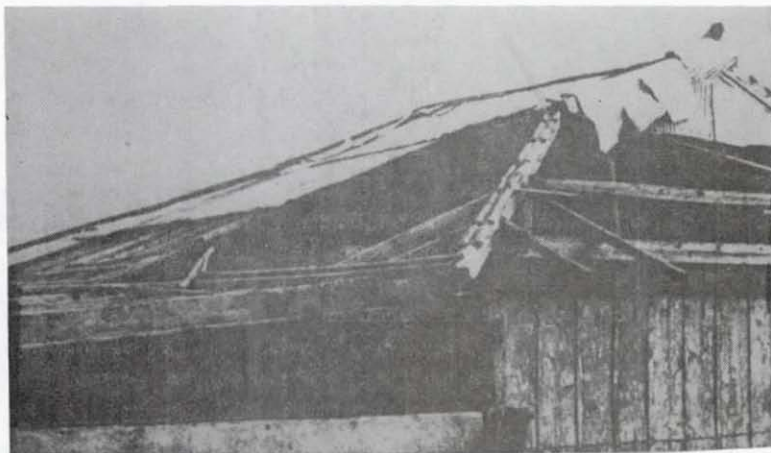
DAMAGE TO SHEET METAL ROOFING WITHOUT BED BOARDS
